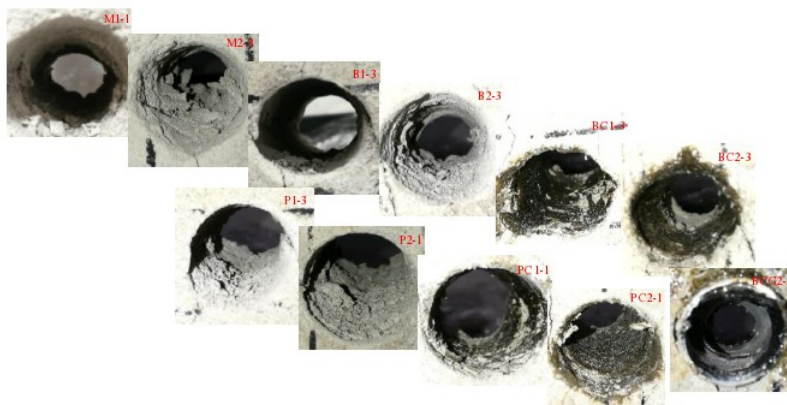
Hole inwall damage-failure condition of reinforced rock with hole
